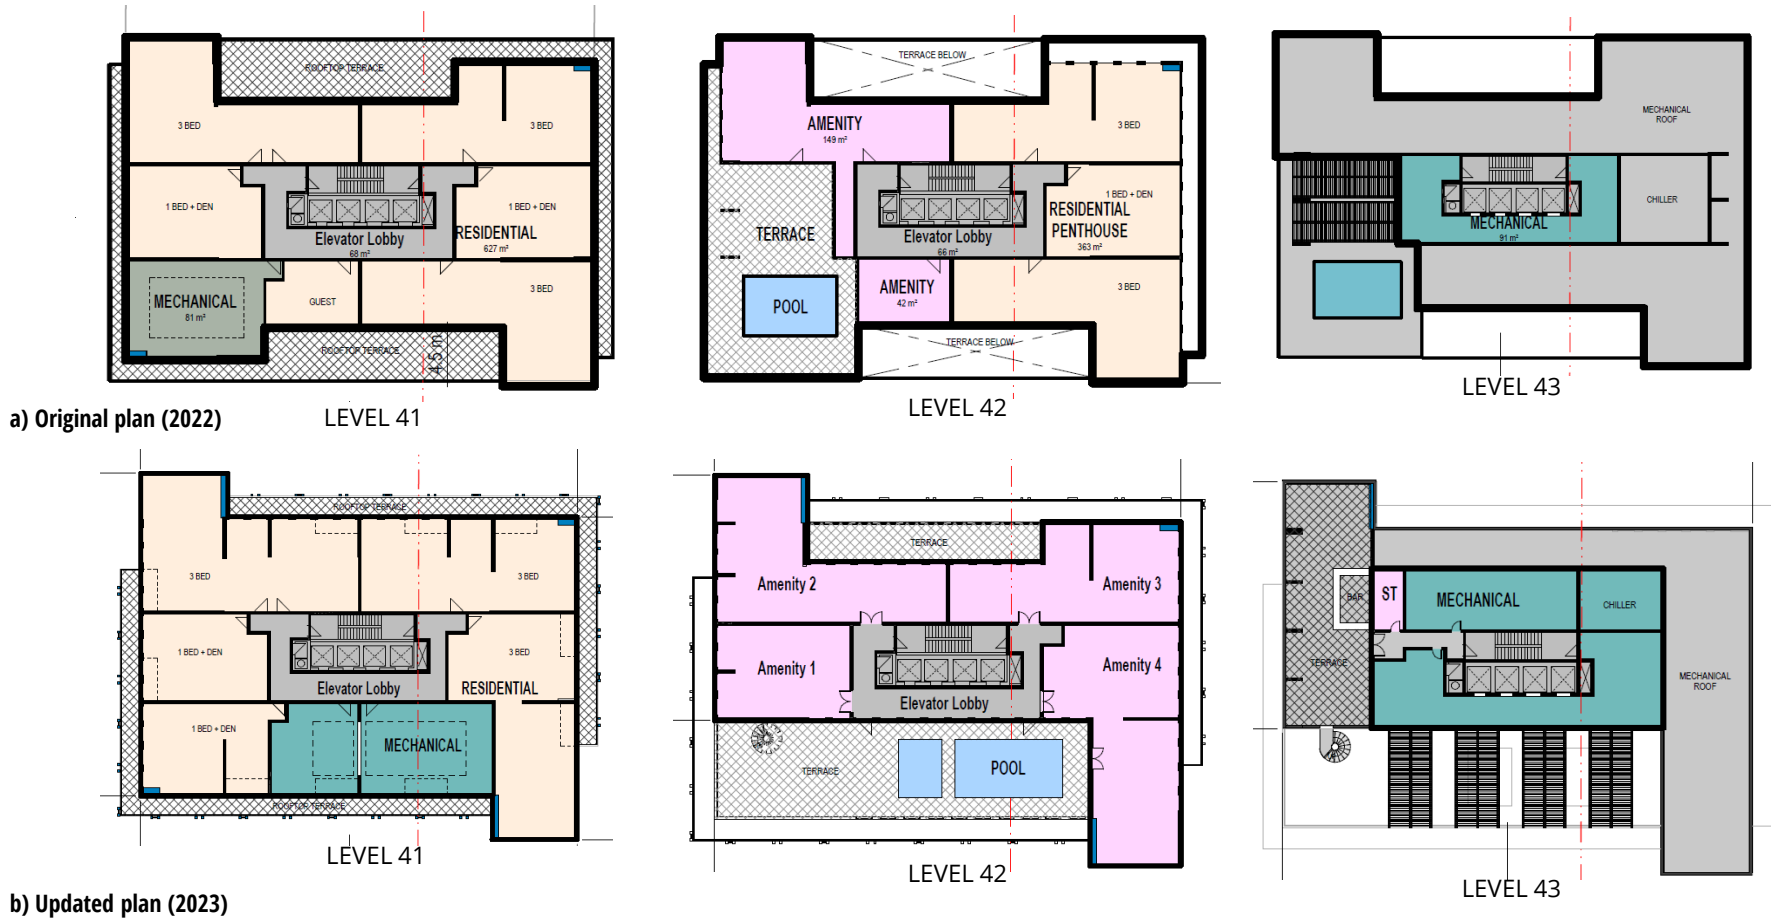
Roof top terraces on Tower 2 : Original plan 2022 (top) ; Updated plan 2023 (bottom)
